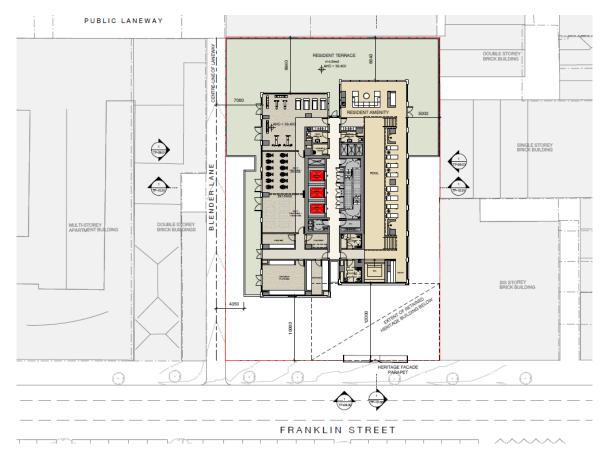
Level 5 floor plan showing positioning of tower above heritage roof (Source: Applicant)
